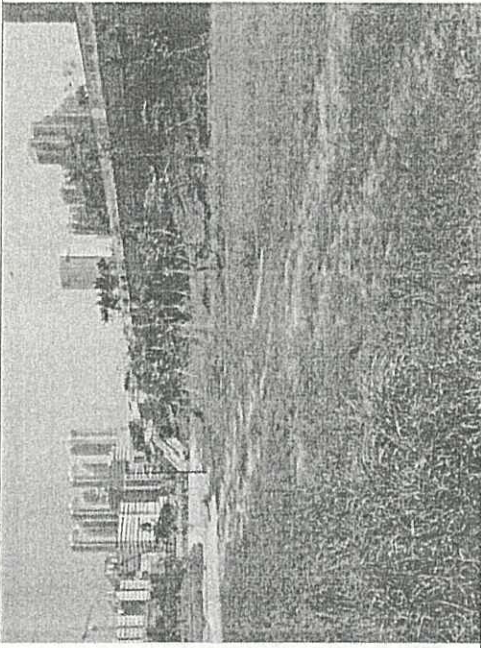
Hydroseeding and wood mix planting at Nam Cheong Park.
